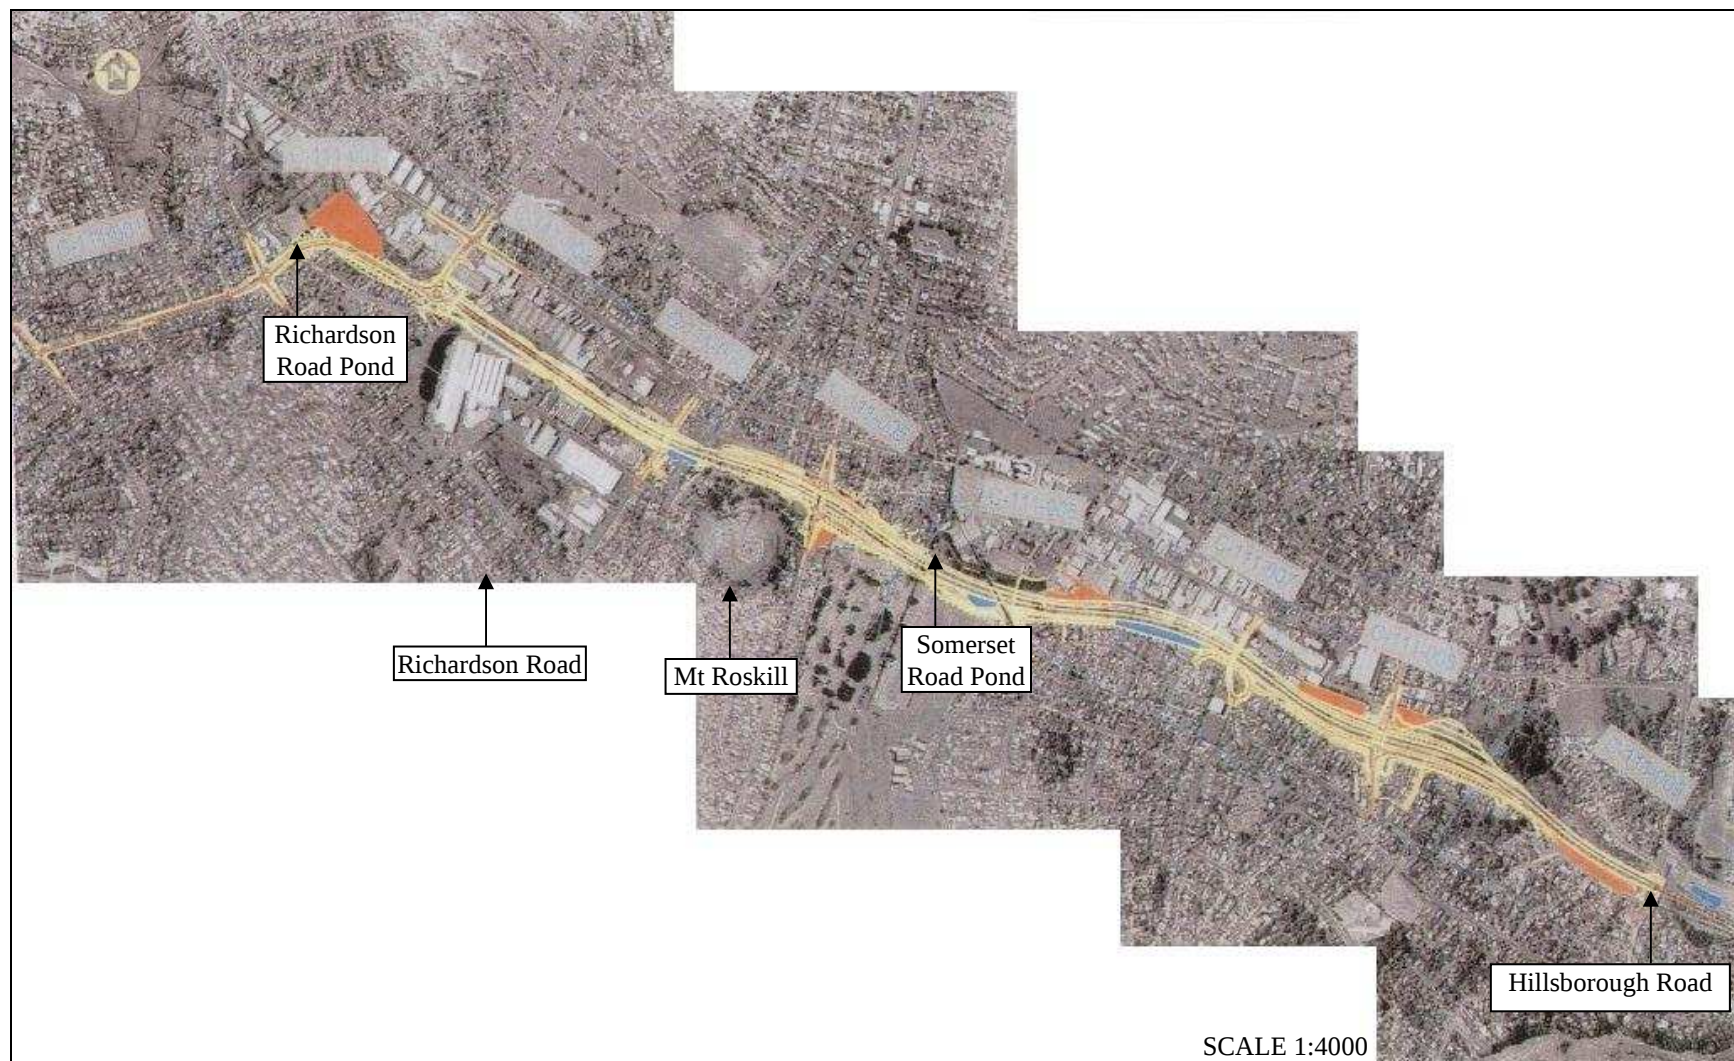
Aerial photo of the SH20 Mount Roskill Extension showing the location of the ponds studied (Photo courtesy of Transit, 2007).
